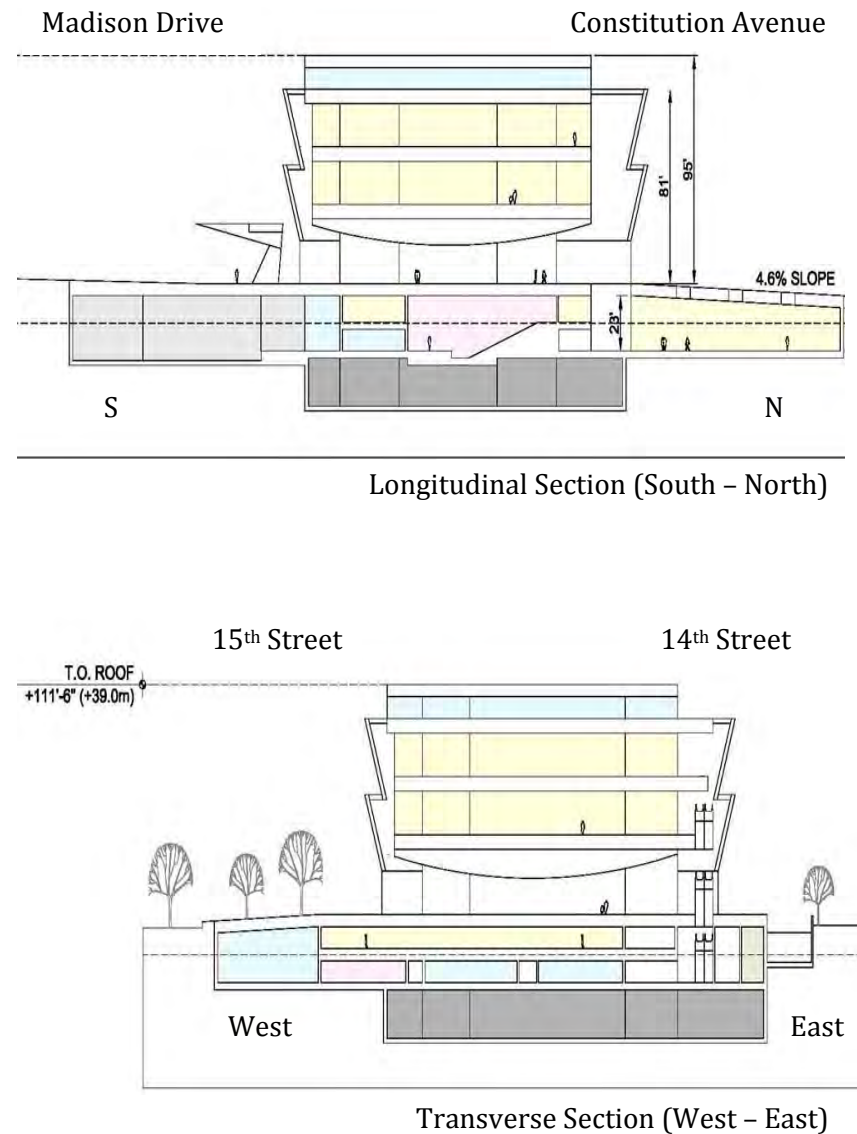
Shorter Pavilion Scheme: Building Alignment
